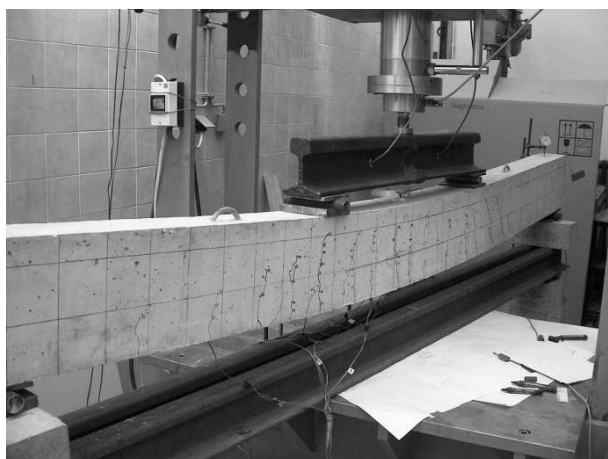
Layout of the tested RC beams / Schema încărcării grinzii din beton armat.
